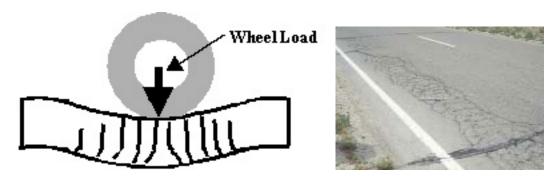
Fatigue or Alligator Cracking of Flexible Pavement (FHWA 2005)
